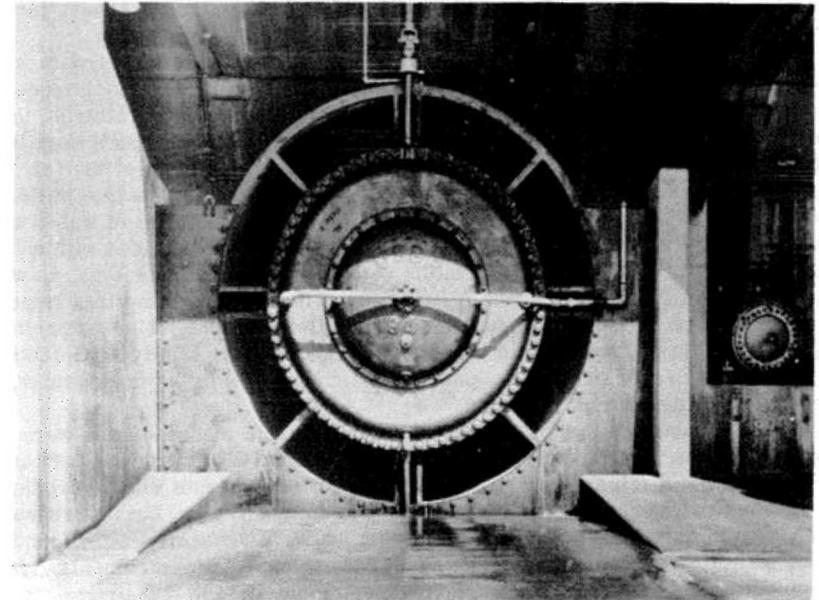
Two-rack conduit (horizontal) encasing piezometer
